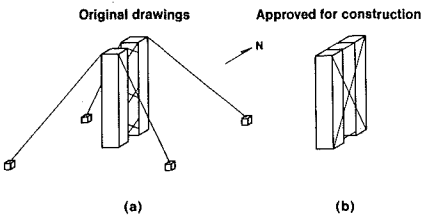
Comparison of Guying System in Original Drawings With System Approved and Used in Construction
